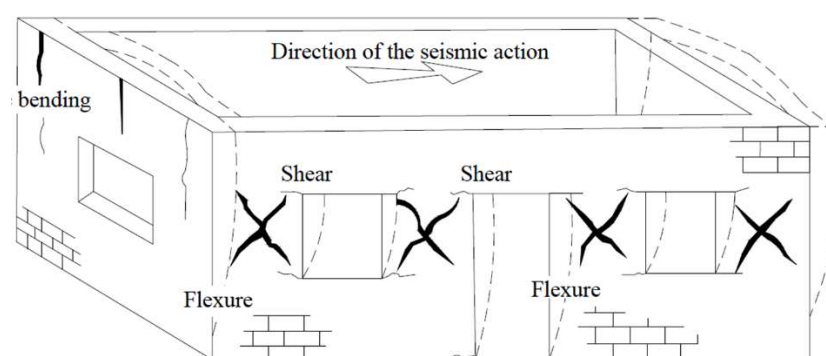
Typical damage to structural walls (adapted from Tomasevic (1990)).
